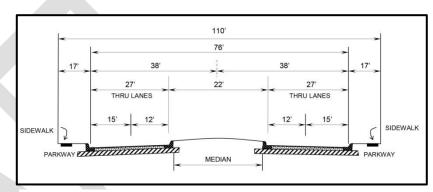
MAJOR ARTERIAL CROSS-SECTION (FOUR LANES DIVIDED)
